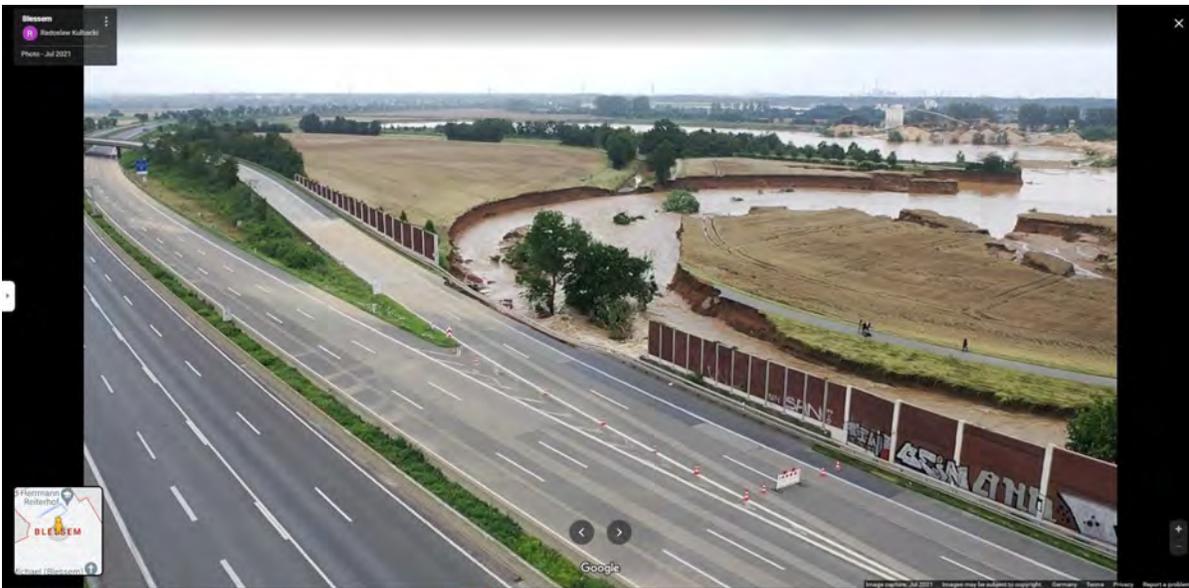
Aerial photograph showing damage to embankment and noise protection wall along freeway A1.
